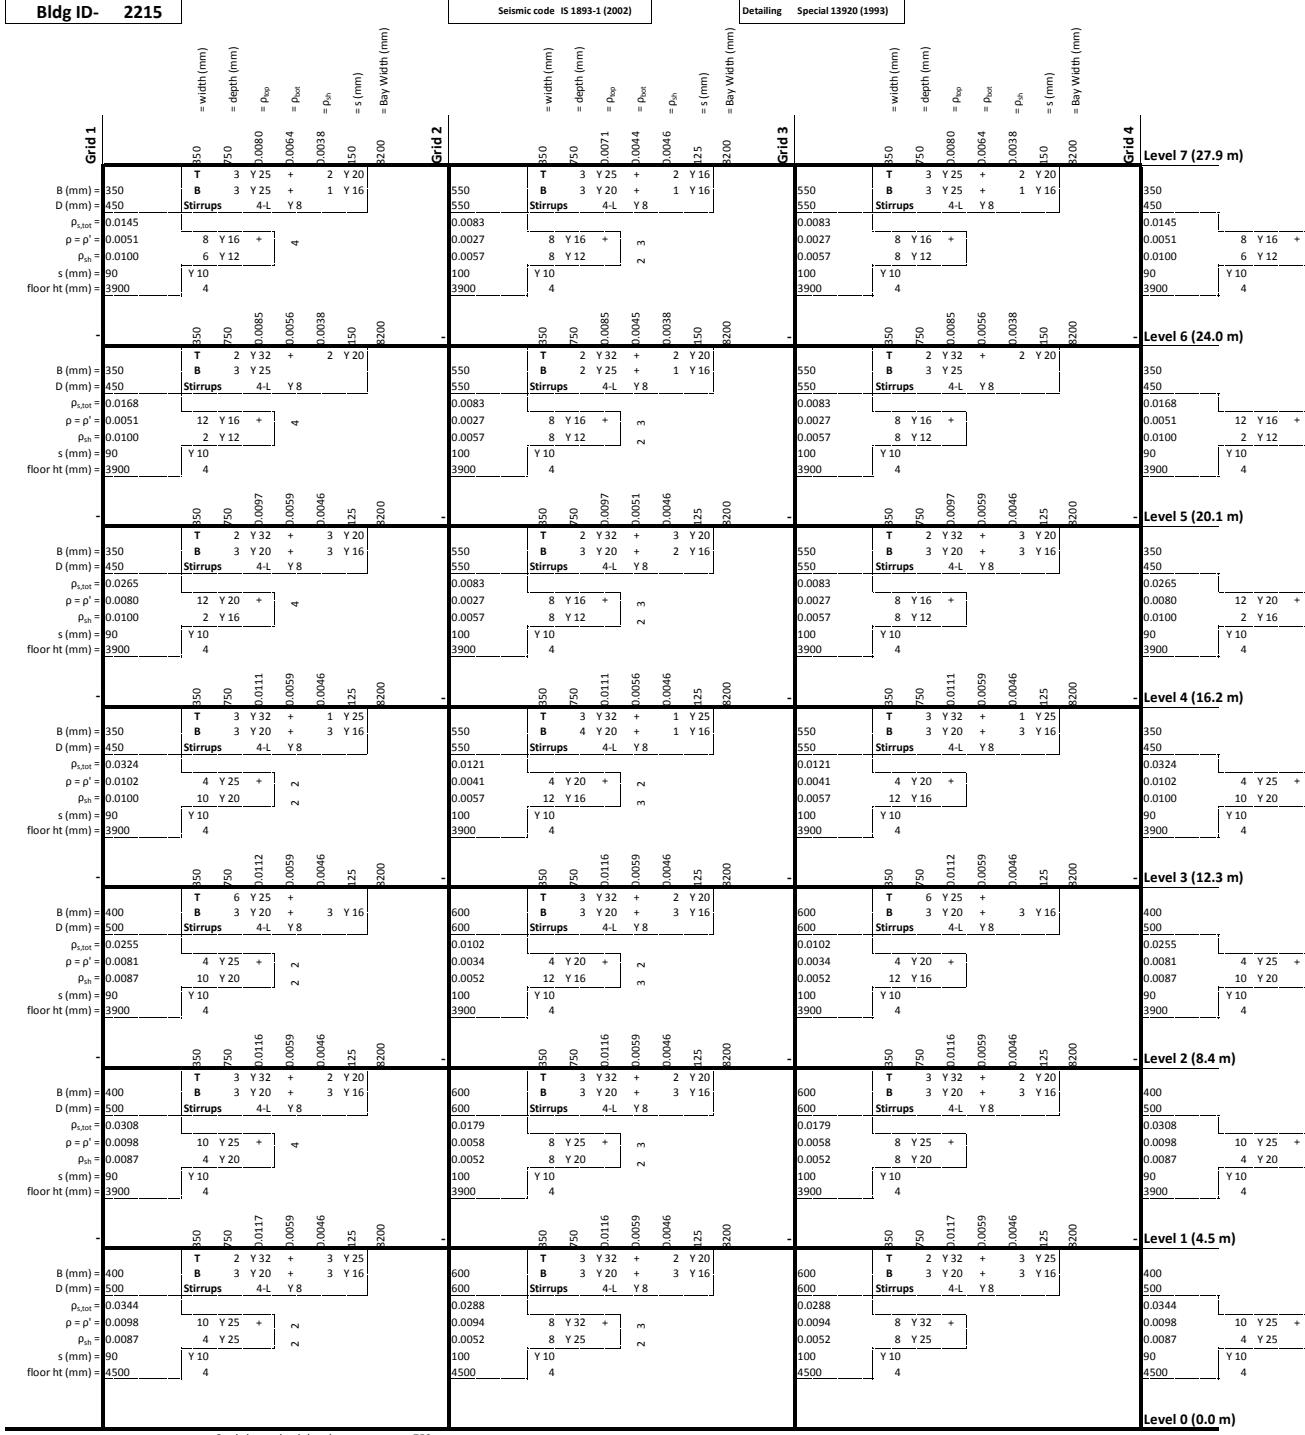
Provided reinforcement and modeling details for building ID 2215
